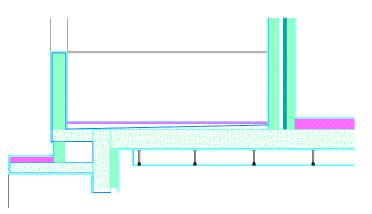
Balcony with outside wall detail (CIVI4, 2015).
